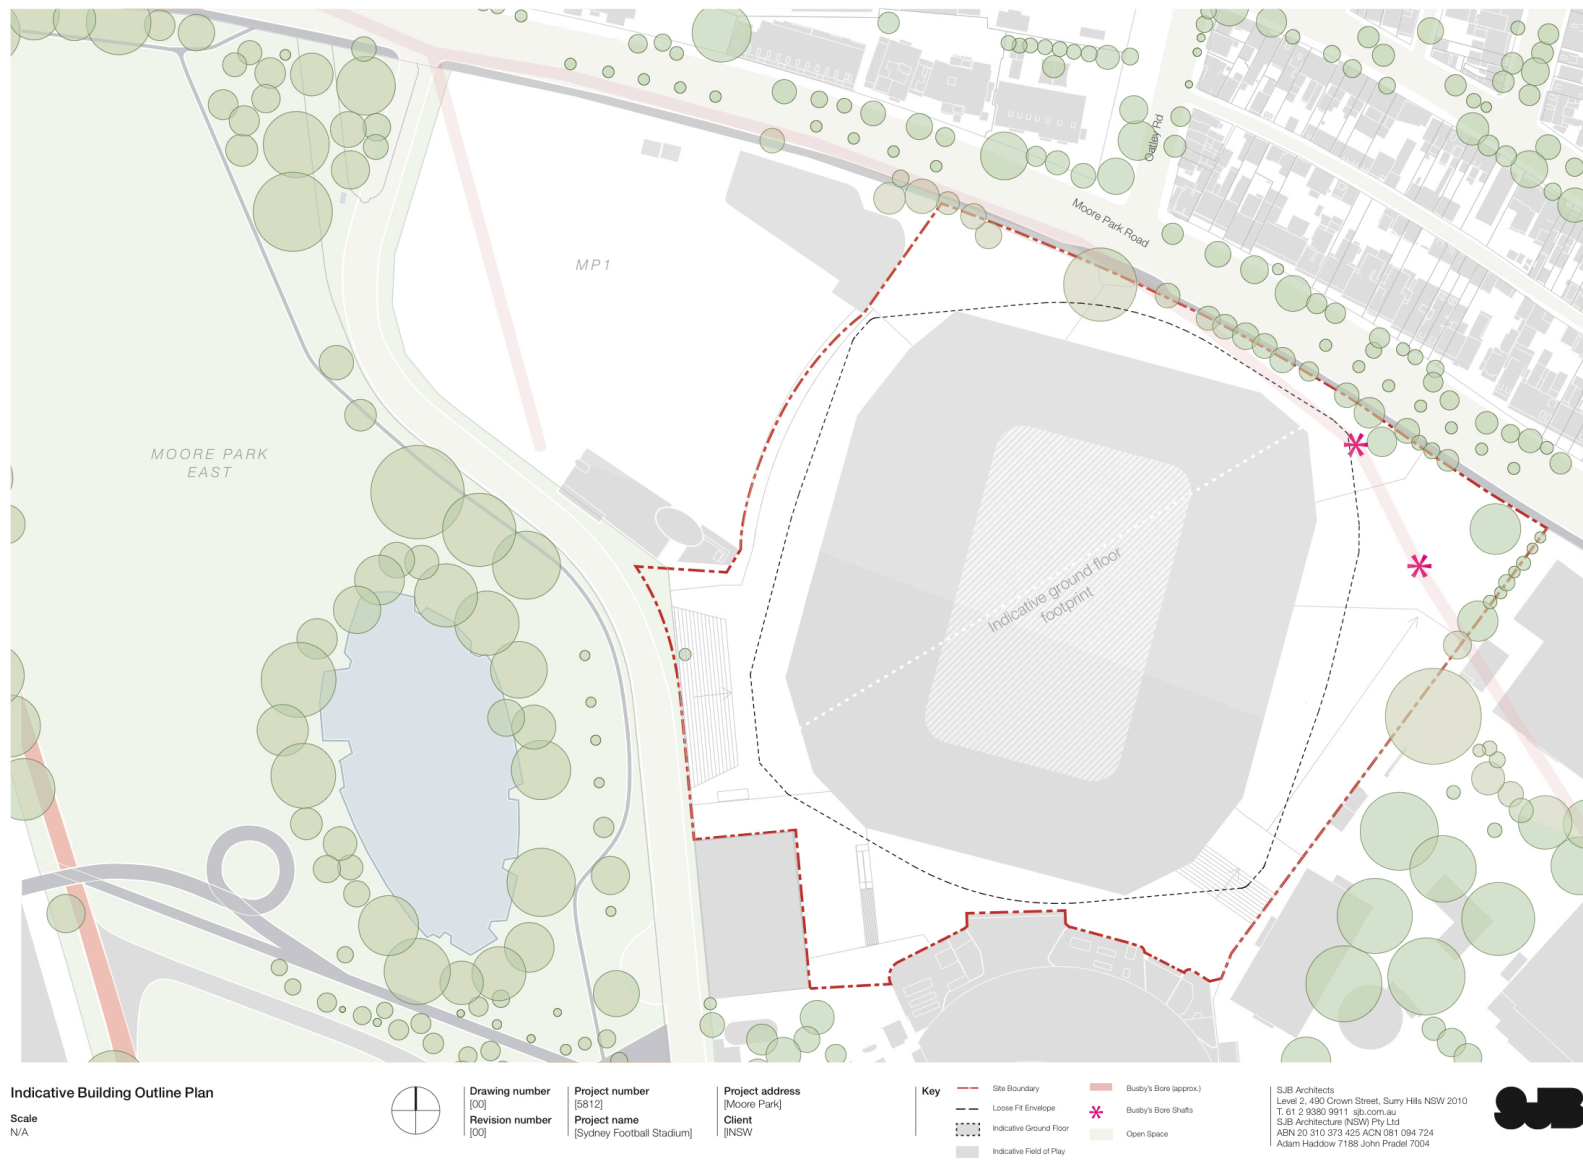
INDICATIVE BUILDING OUTLINE PLAN (SOURCE: SJB ARCHITECTS, 2018)
